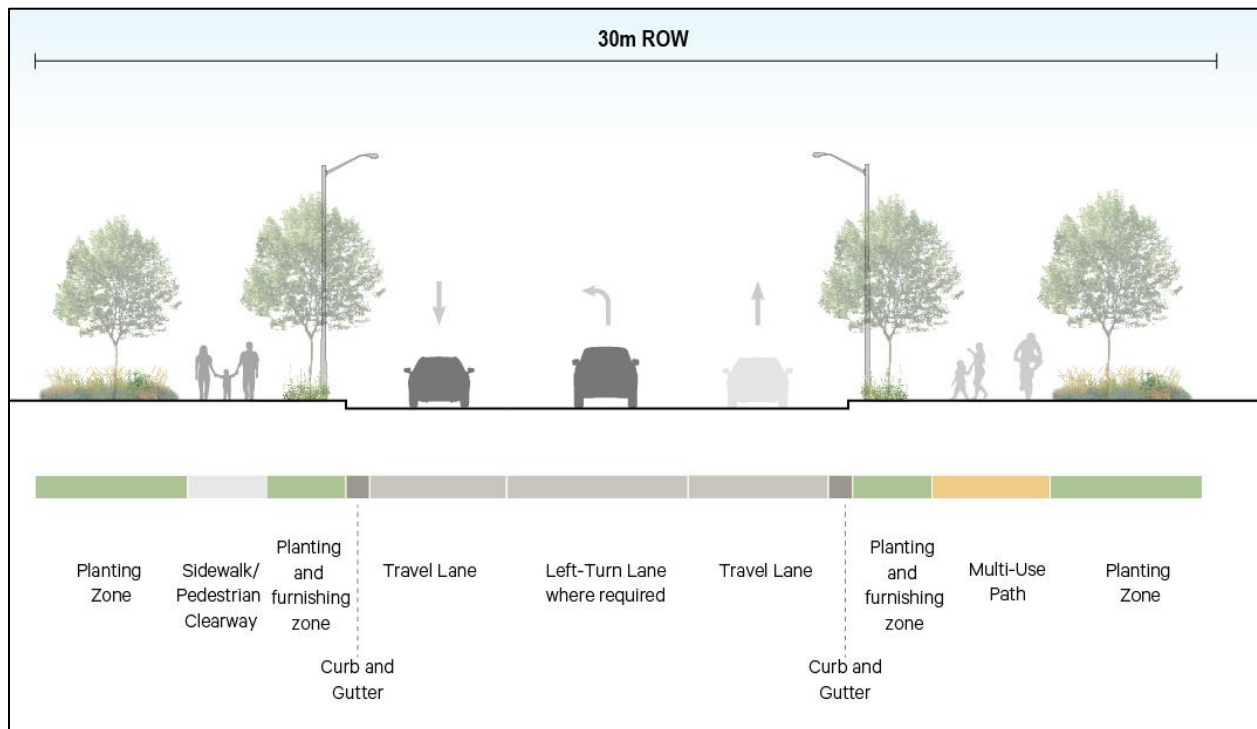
Type C Arterial Road Cross Section (Arthur Street, and East Part of Concession Road 3)
